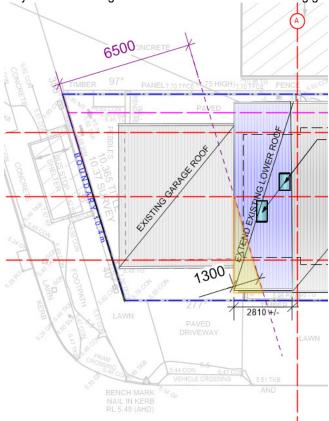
Proposed roof plan showing small area of proposed reconfigured roof that encroaches into front boundary setback area (behind garage roof)
